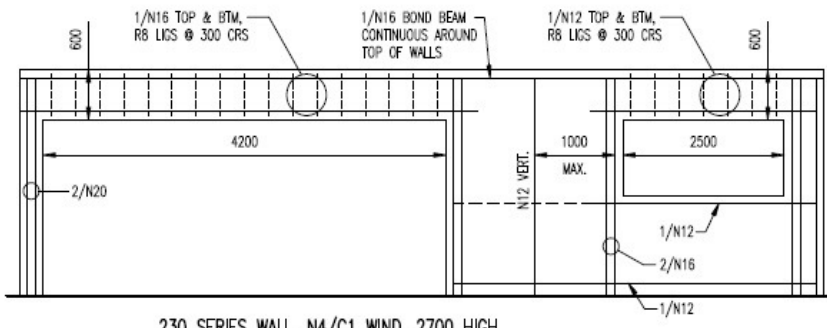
2700 High Wall, N4/C1 Wind Rating, 230 Series ECO-Block (Max. roof load width: 9.0m)
